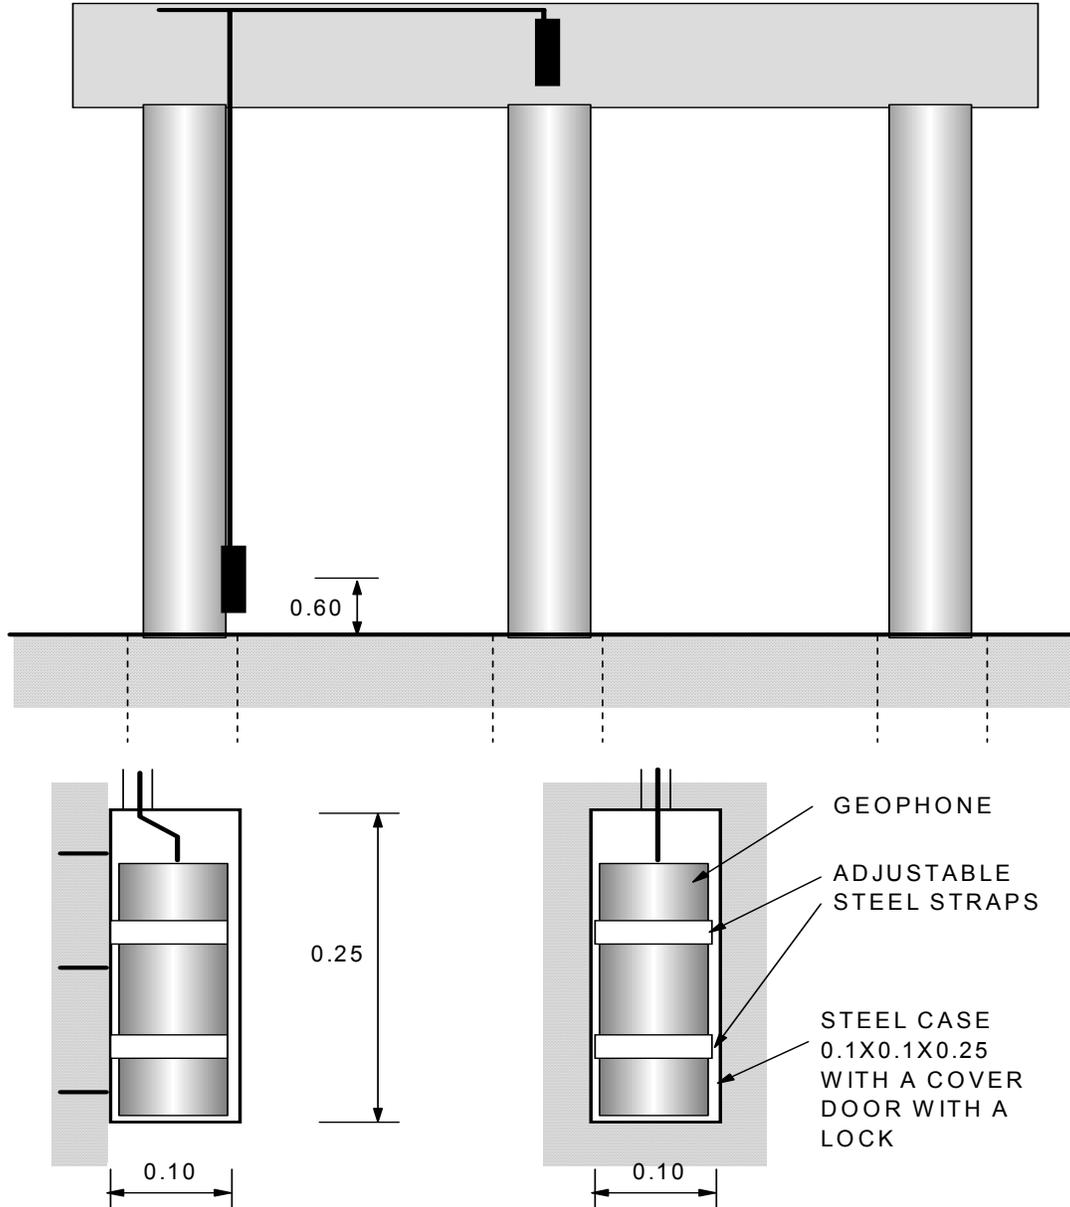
Installation of protective cases for geophones on piers and pier-caps.
